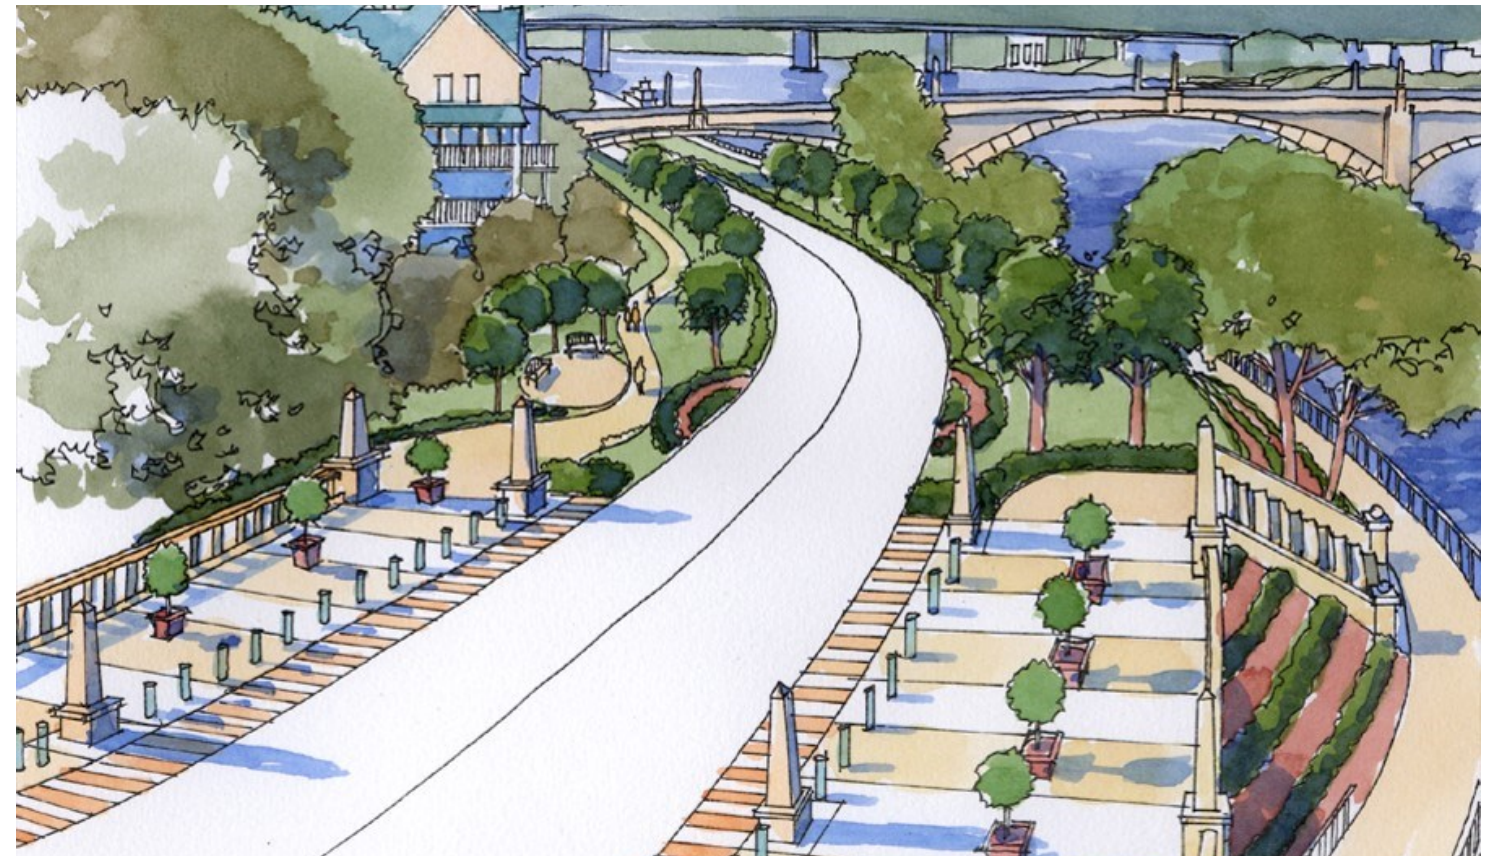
Concept Sketch for Riverfront Parkway Street Design
